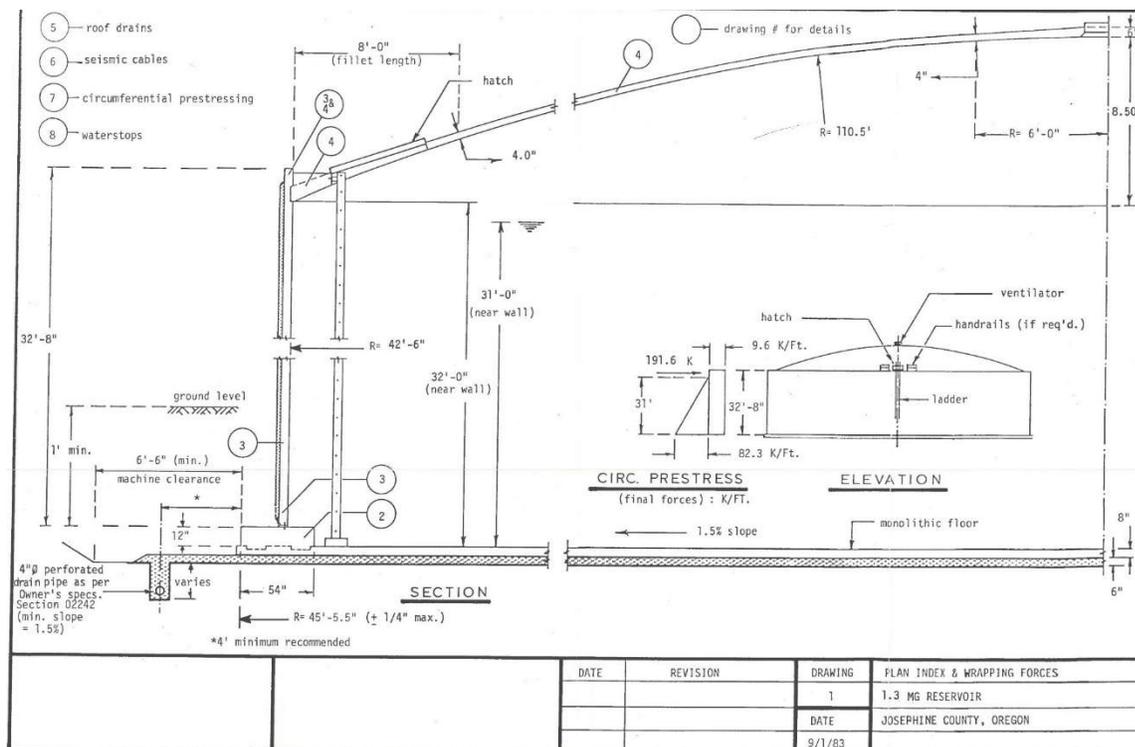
Reservoir Plan Index & Wrapping Forces
